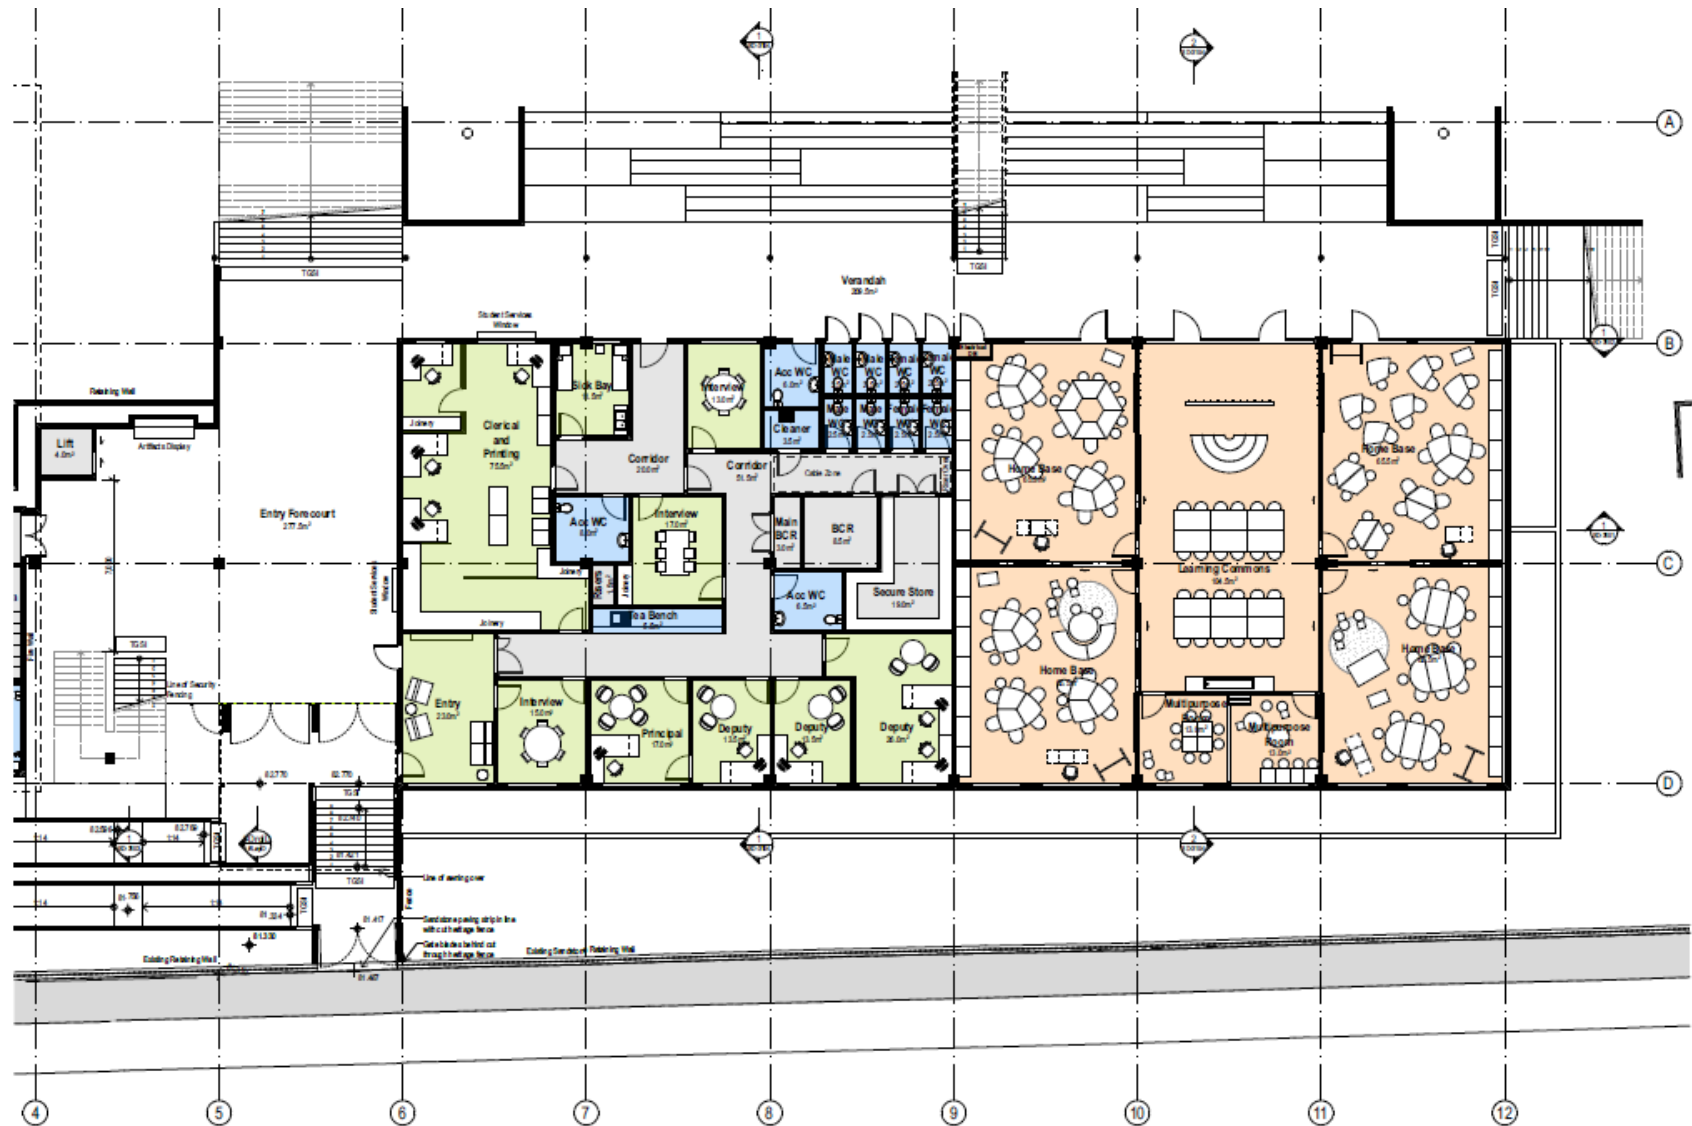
Building I Level 1 Floor Plan. Source: Fulton Trotter, 2021; Drawing No. SD-2002, Rev F, 13.8.2021.
